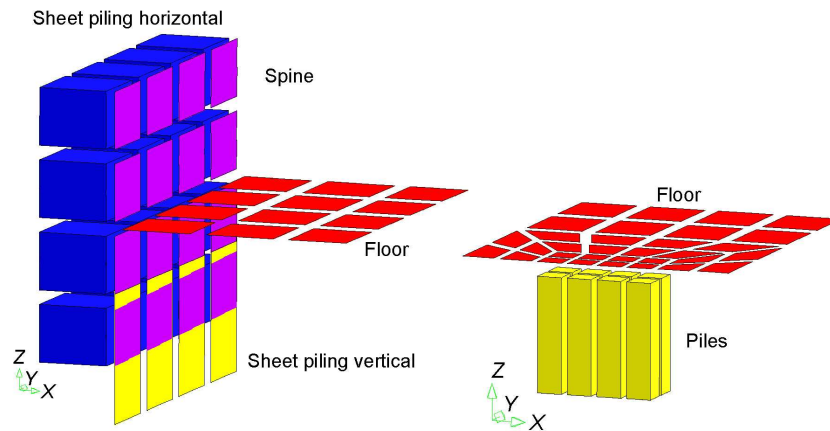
Model for connection sheet piling–floor and floor–piles
